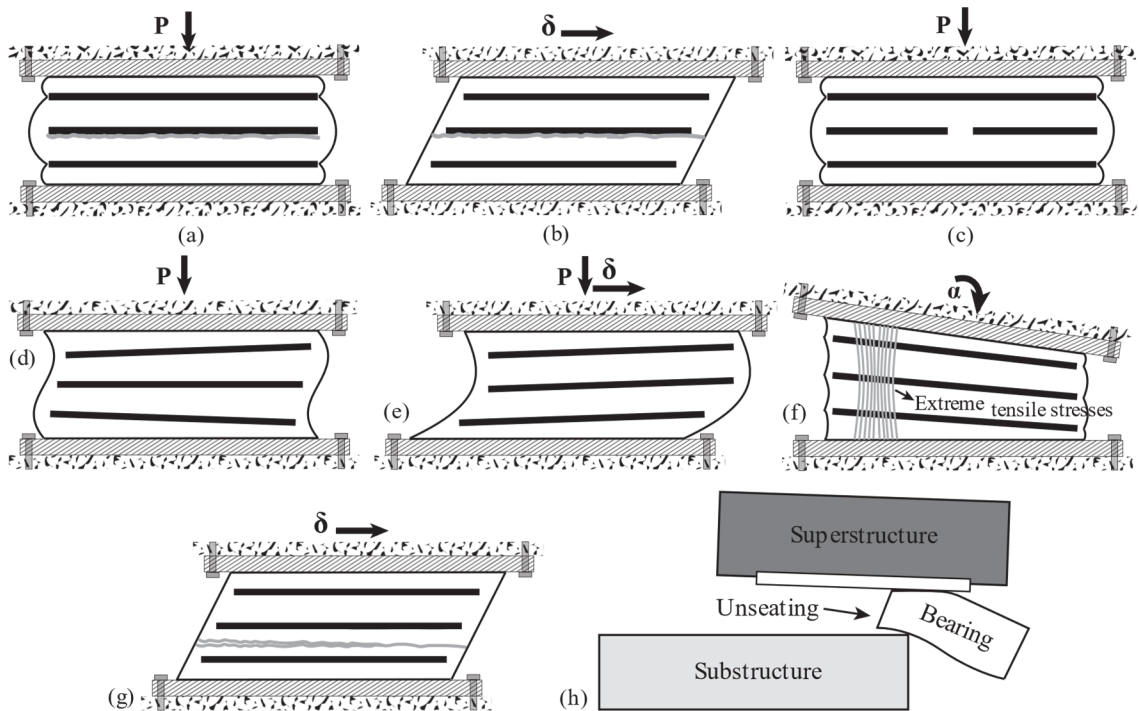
Failure modes in elastomeric bearings: (a,b) shear delamination; (c) fracture of a steel laminate; (d,e) buckling; (f) uplift; (g) rubber tearing; (h) unseating
